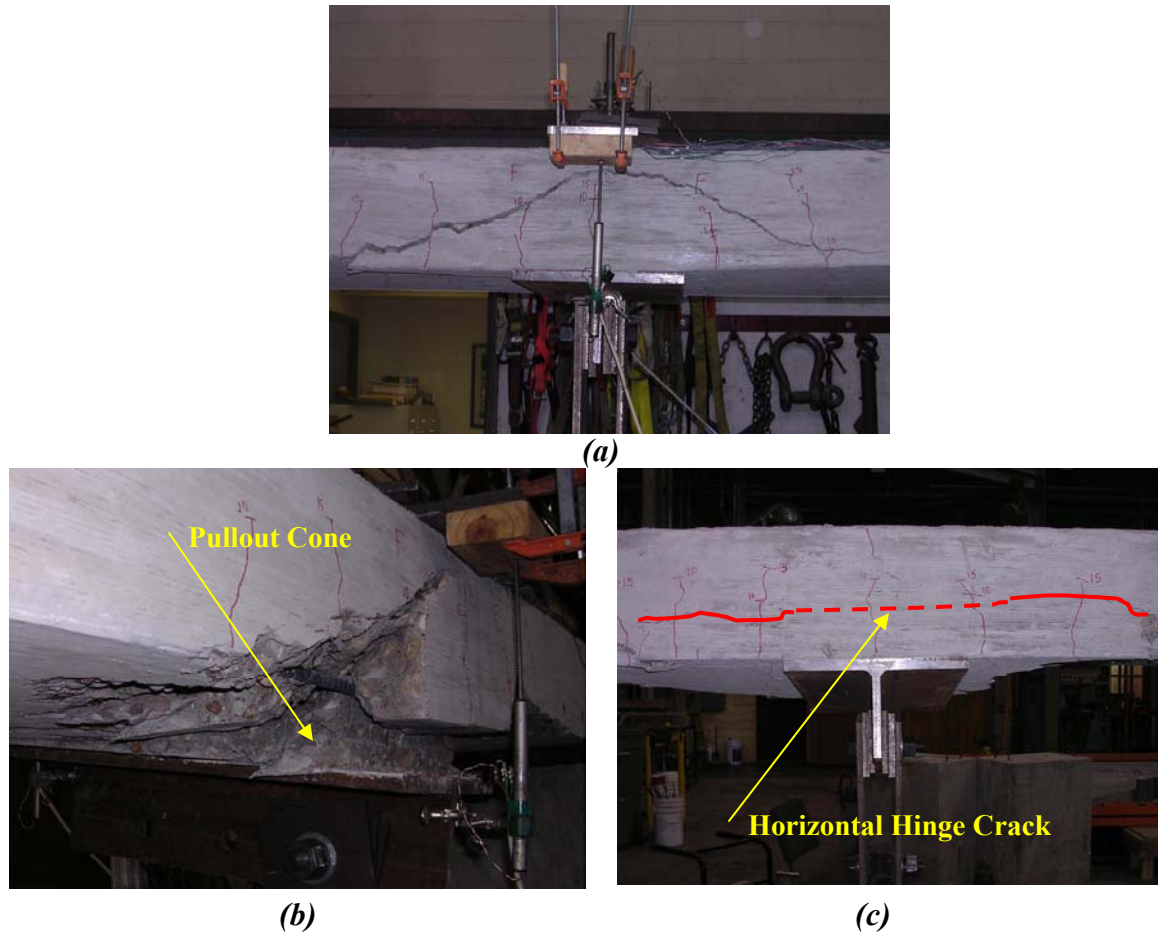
Failure Sequence for No-Haunch Specimen Loaded Eccentrically (a) Horizontal Crack Formation (b) WT and Failure Cone Rotation (c) Back Side Hinge Crack
